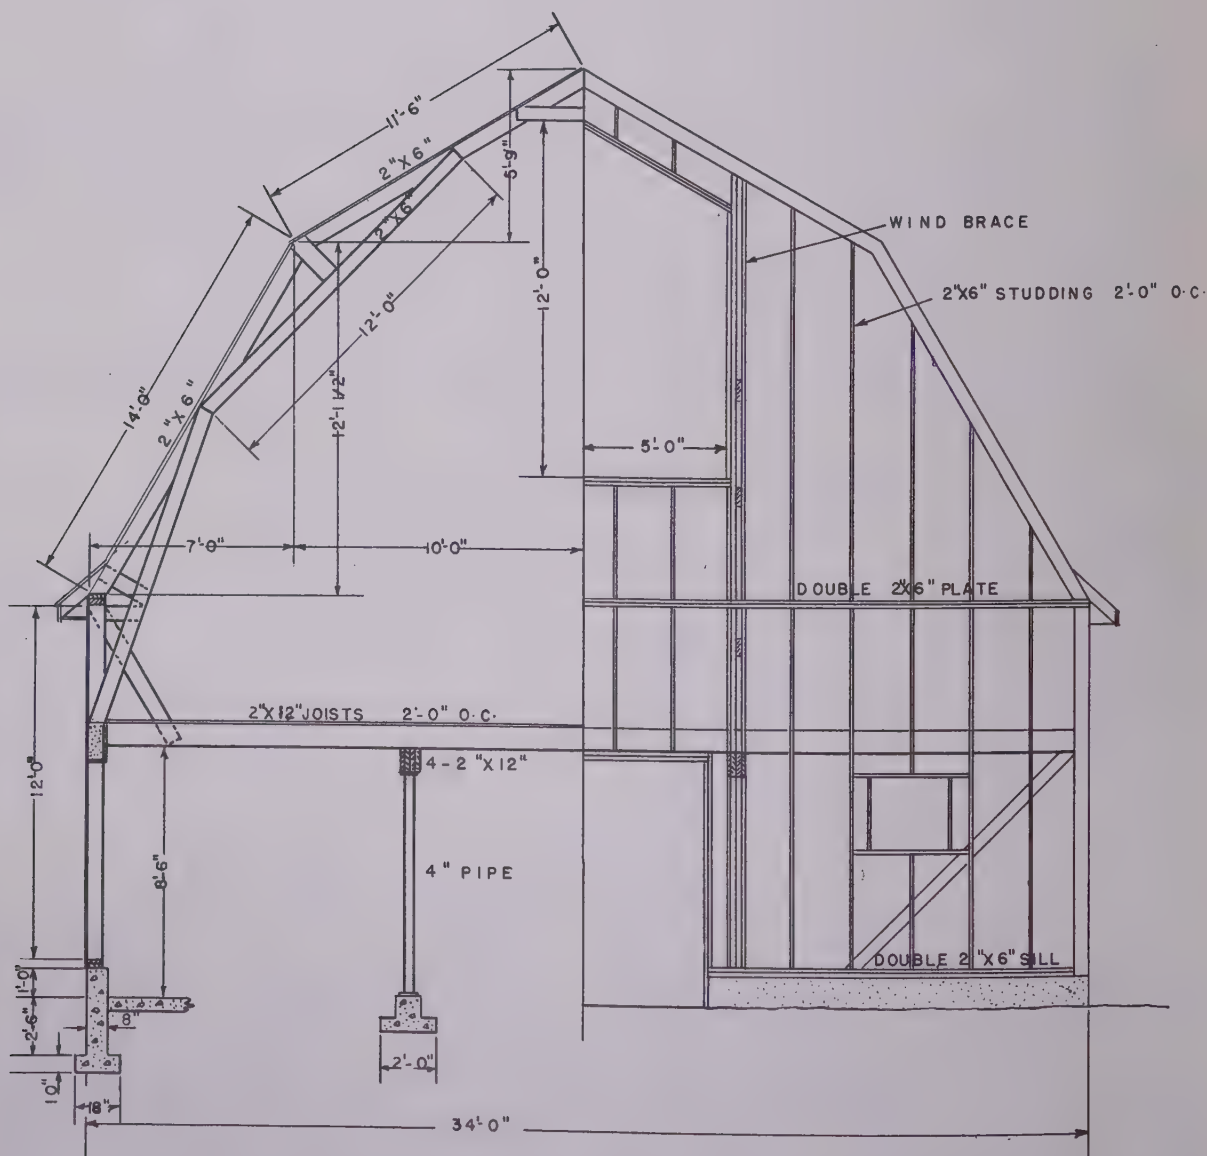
Half section and half end framing of gambrel-roofed barn.
